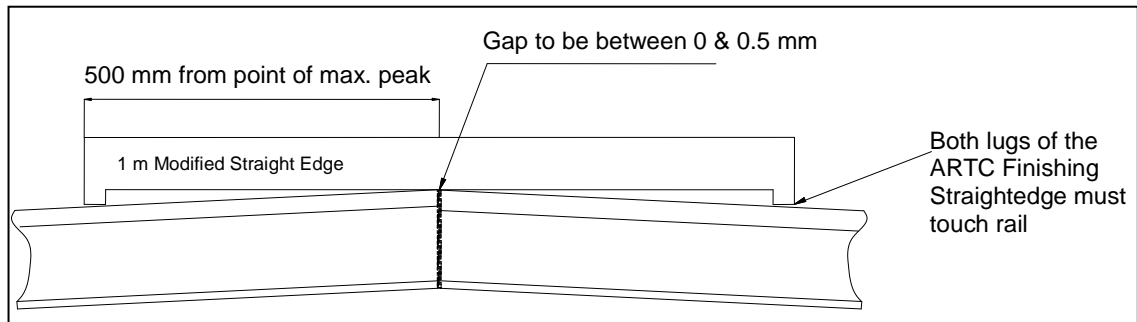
Peak weld measurement using the ARTC Finishing Straightedge
